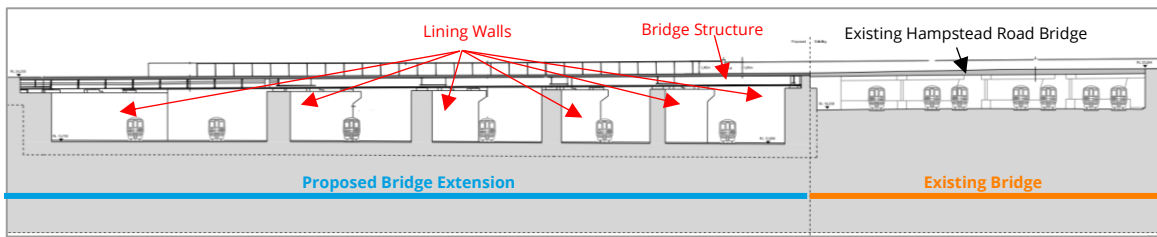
Long section looking north (extract from drawing 1MC03-SCJ\_SDH-AR-DSE-SS01\_SL12-010021). Elements for Schedule 17 approval under this submission are labelled in Red.
